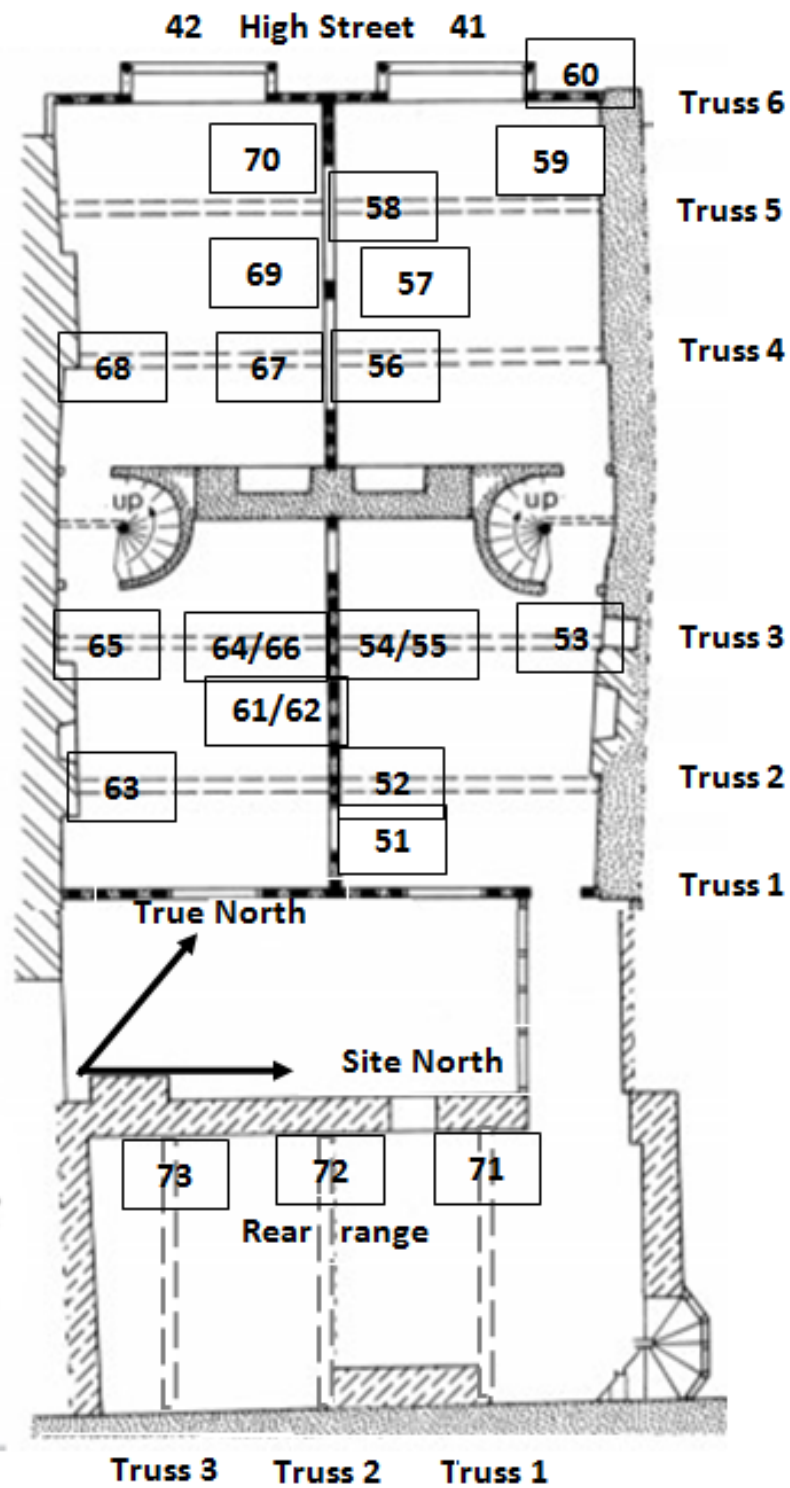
Plan of 41–42 High Street to help locate sampled timbers (after John Thorpe)
